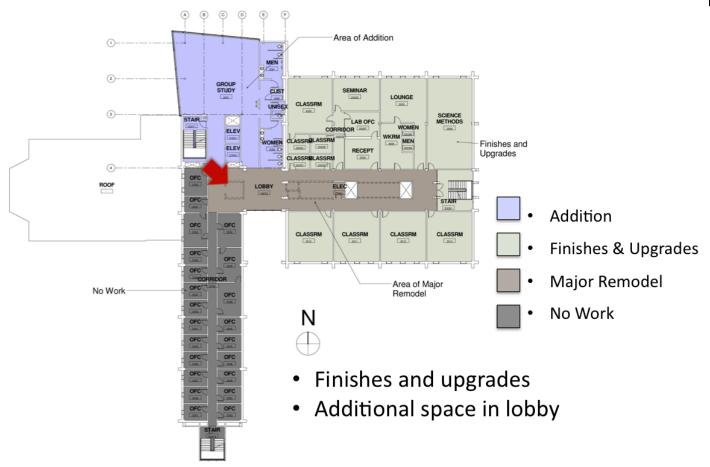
Level 3 Floor Plan, Features, & Rendering Location
